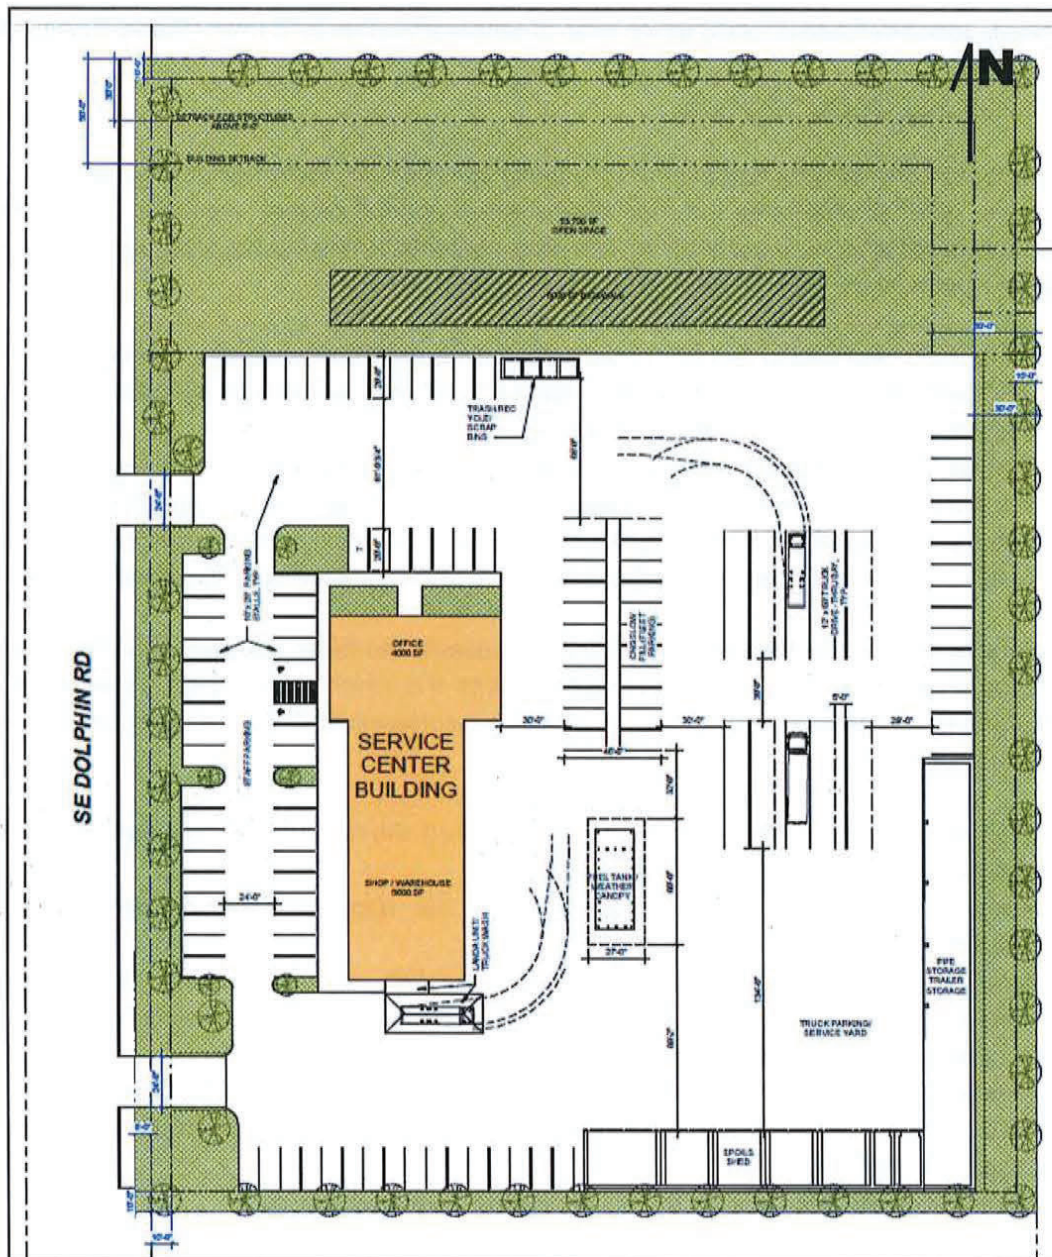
Site plan "Option A" showing the proposed development – prepared by LRS Architects.
